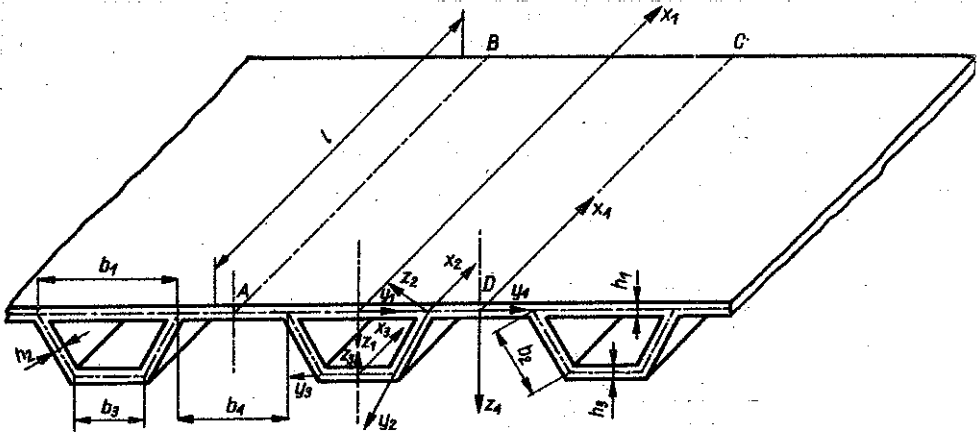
Part of wide plate with closed section longitudinal stiffeners.
